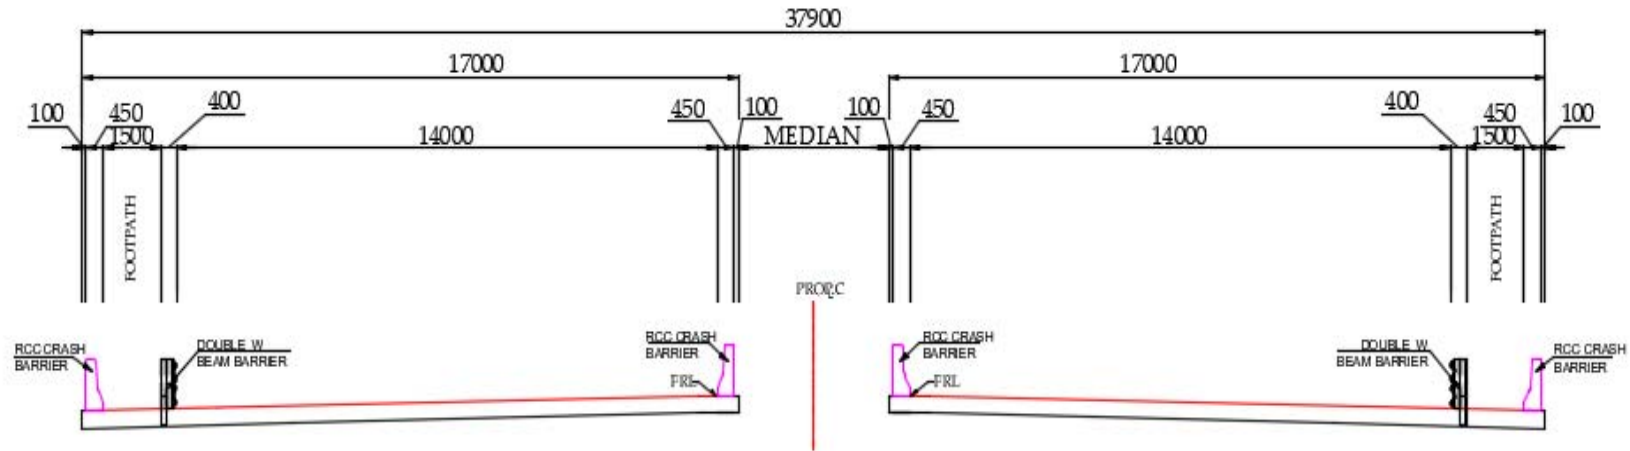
6-Lane Separated Structure & Bridge at Deck Level with Footpath (TCS-13)
